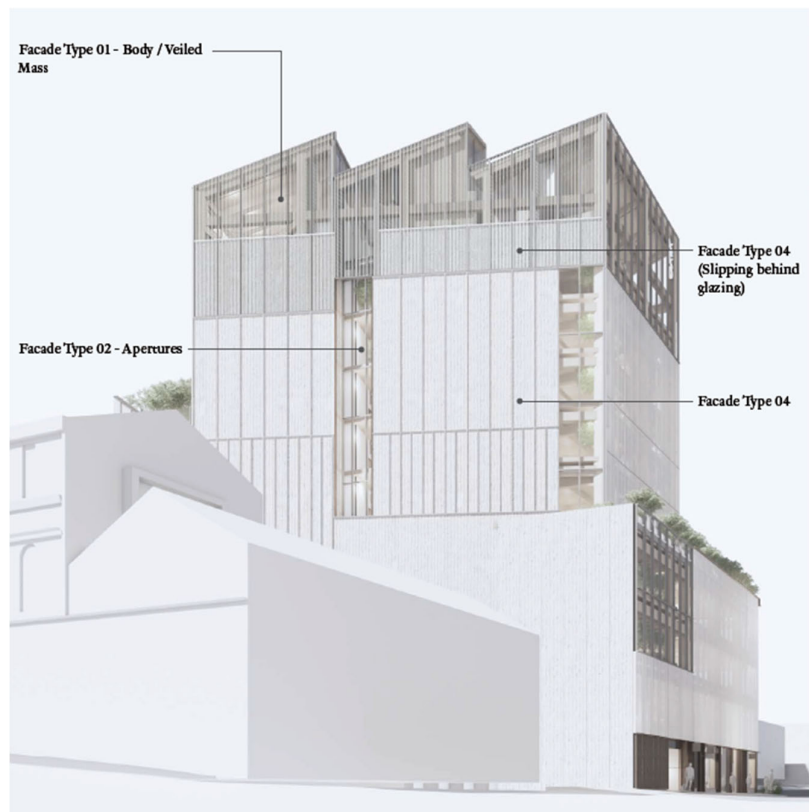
Image G: Render of the proposal outlining proposed material typologies from the intersection of Newton Road and Abbey Street looking toward the western and southern façades of the building²⁸.
